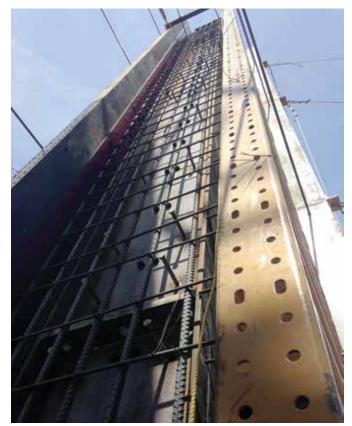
The exposed concrete exoskeleton columns act as both braced frames and moment frames
